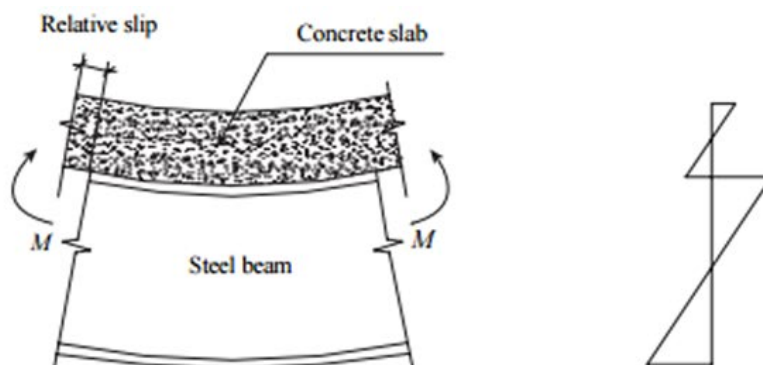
Beam without composite action: (left) force and deformation of steel beam and concrete slab; (right) stress distribution along section height (Li *et al.* 2007).
